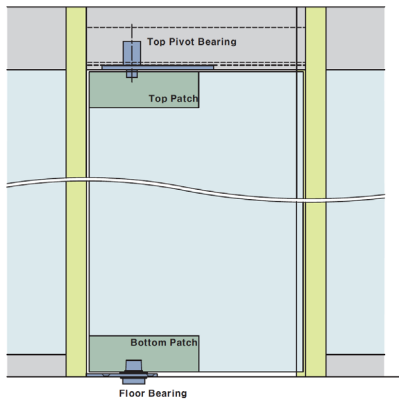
TYPICAL ELEVATION OF GLASS PIVOT DOOR
